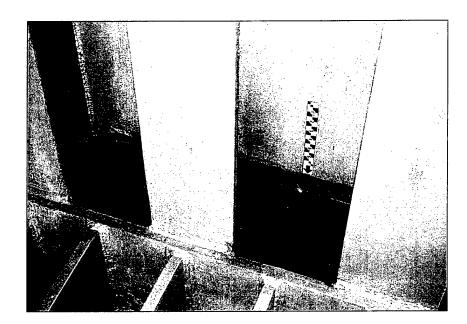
Standing water and debris between purlins, skin plate and upstream horizontal girder flange, typical.
